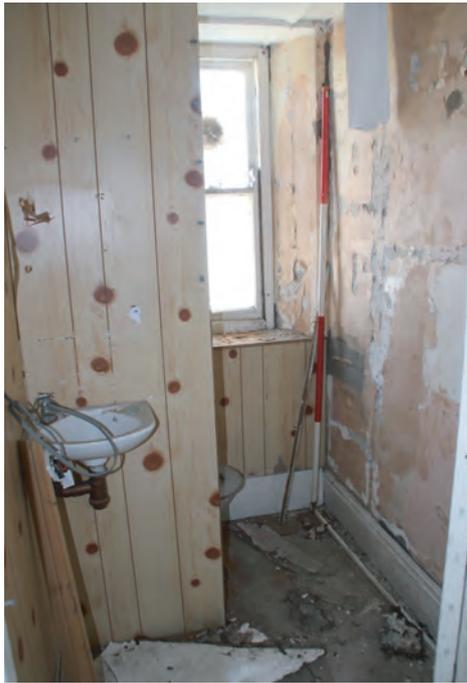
The Old Coal Office, Saundersfoot. View looking mens toilet on first floor.
